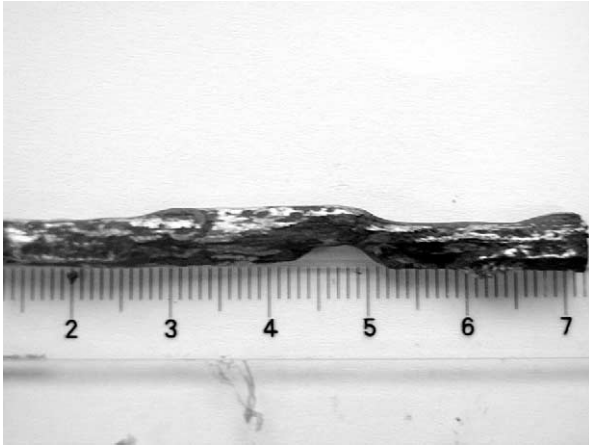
View of a corroded surface rebar after removing corrosion products.
